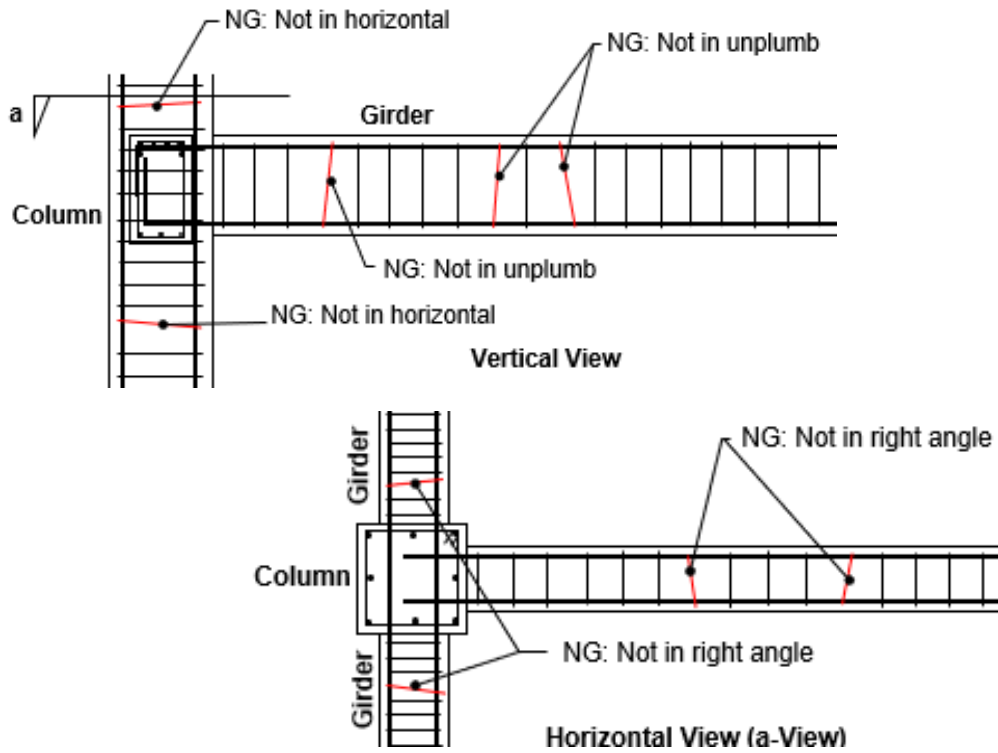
Condition of Stirrup/ Hoop arrangement
